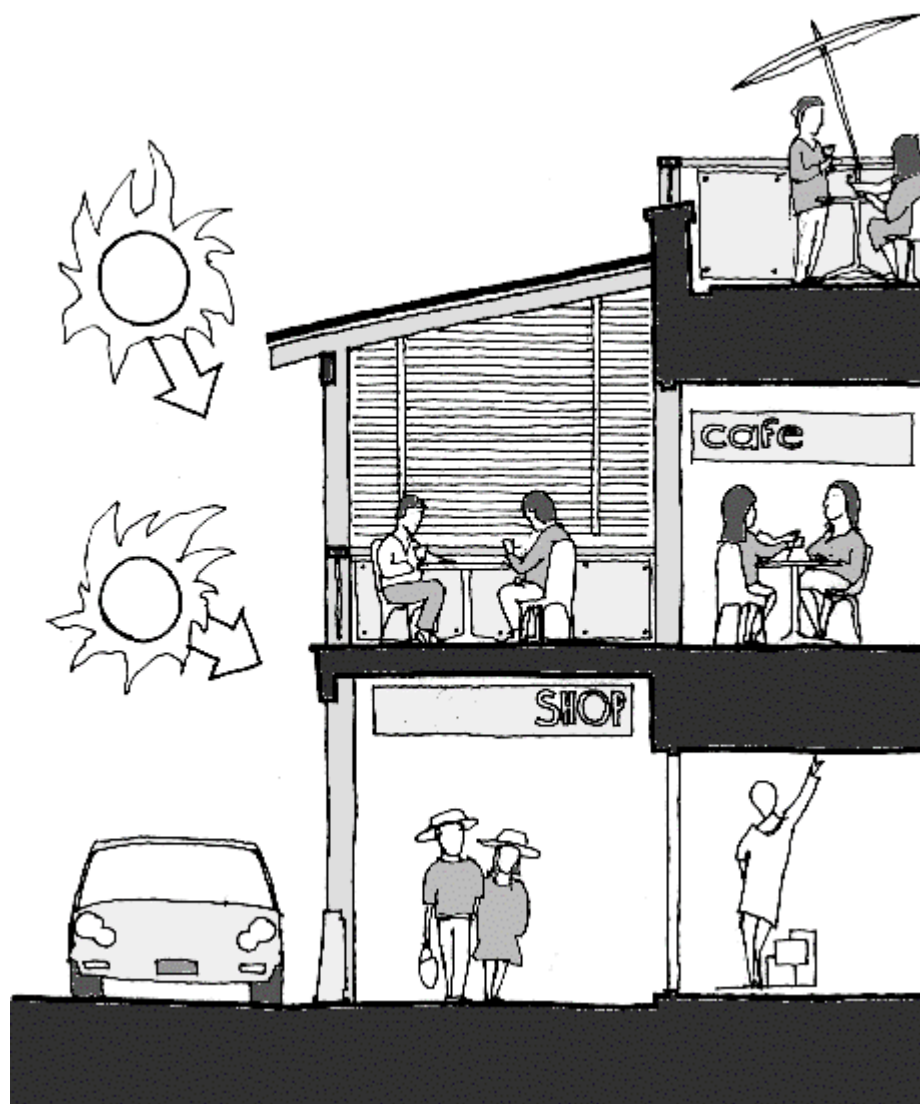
Ettalong Beach Village Centre active street frontages
